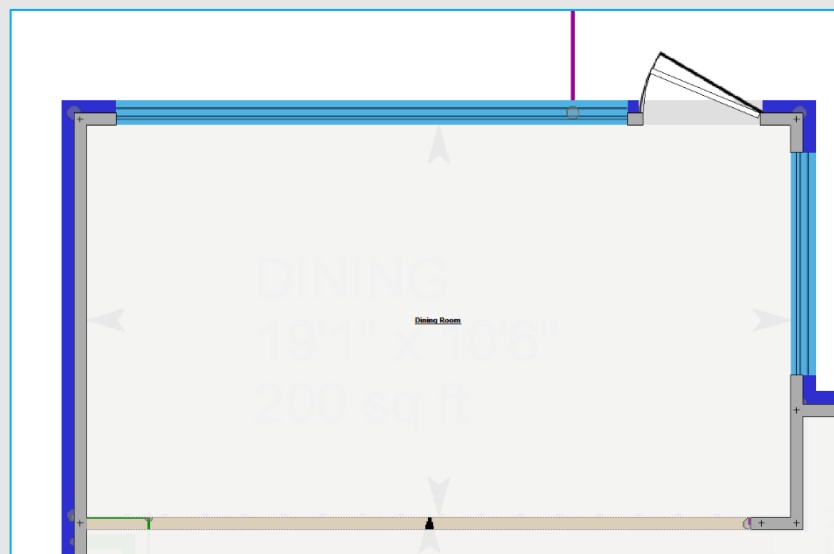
Exterior Walls Drawn to the Interior Face of Walls 2
